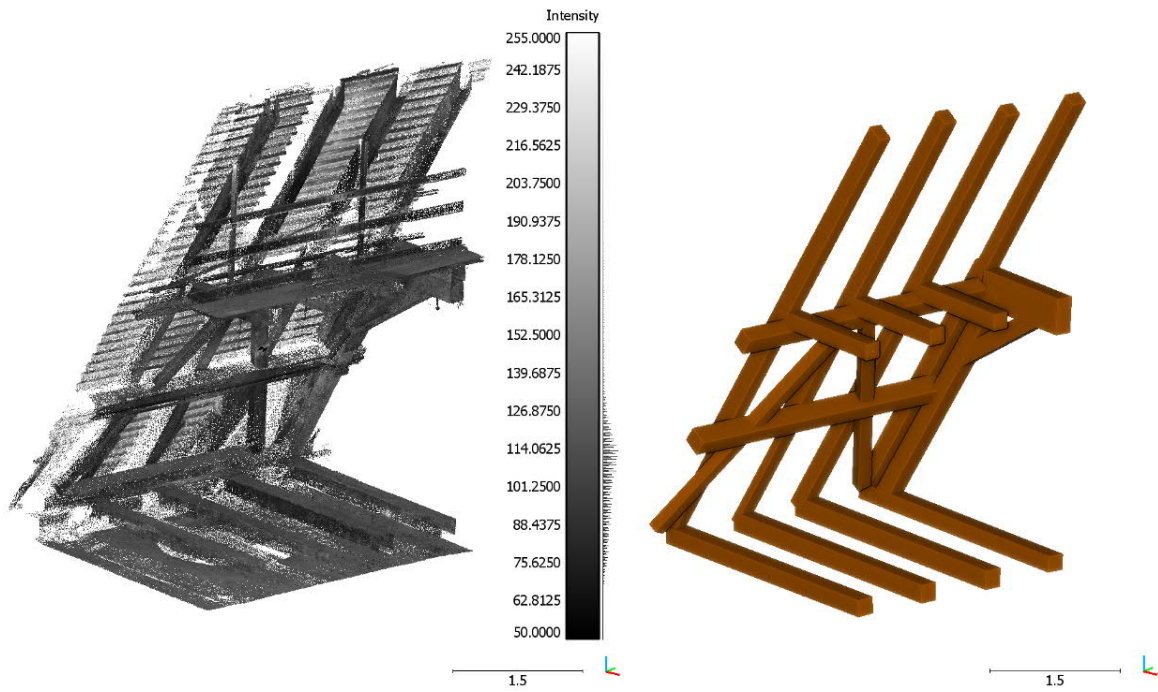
Point cloud of a section of a roof structure (l) and the modelled beams with rectangular cross section (r)
